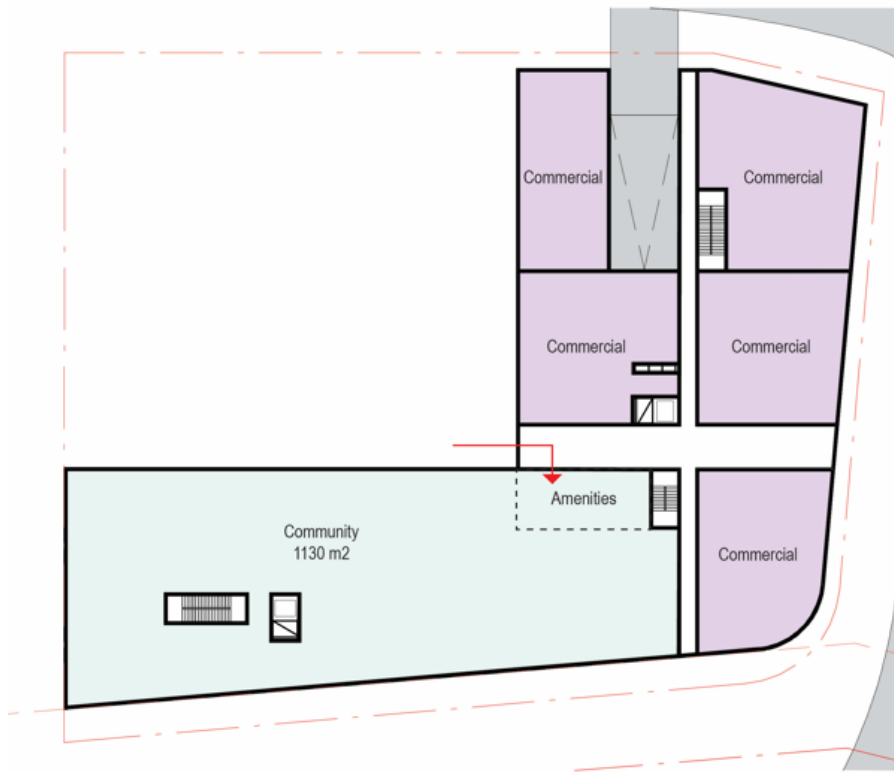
Location of Proposed Multi-Purpose Community Facility and Indicative Ground Floor Layout
